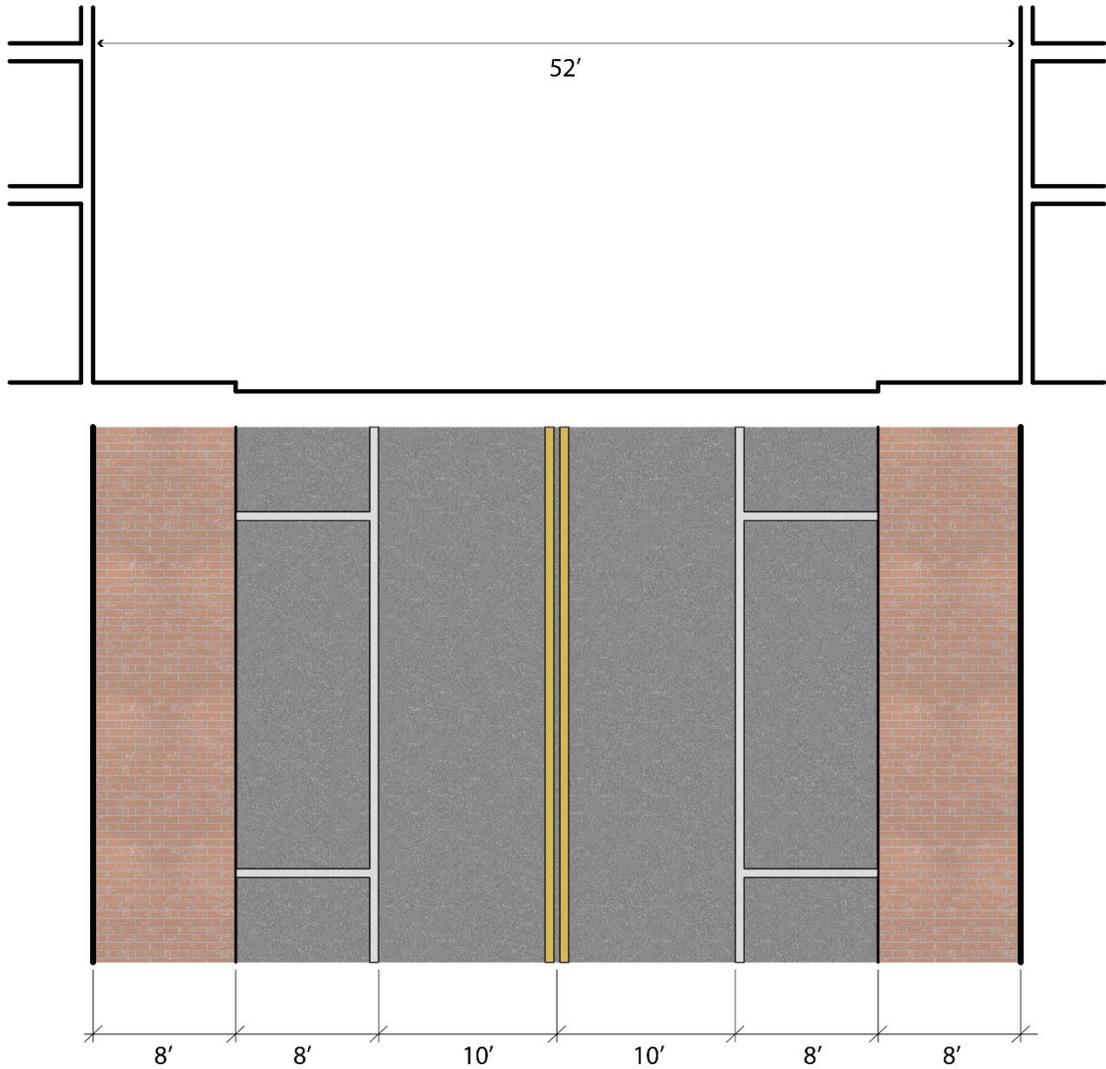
Average street section of Main Street showing driving lanes, parking, and sidewalk width (Graphic created by Author).
